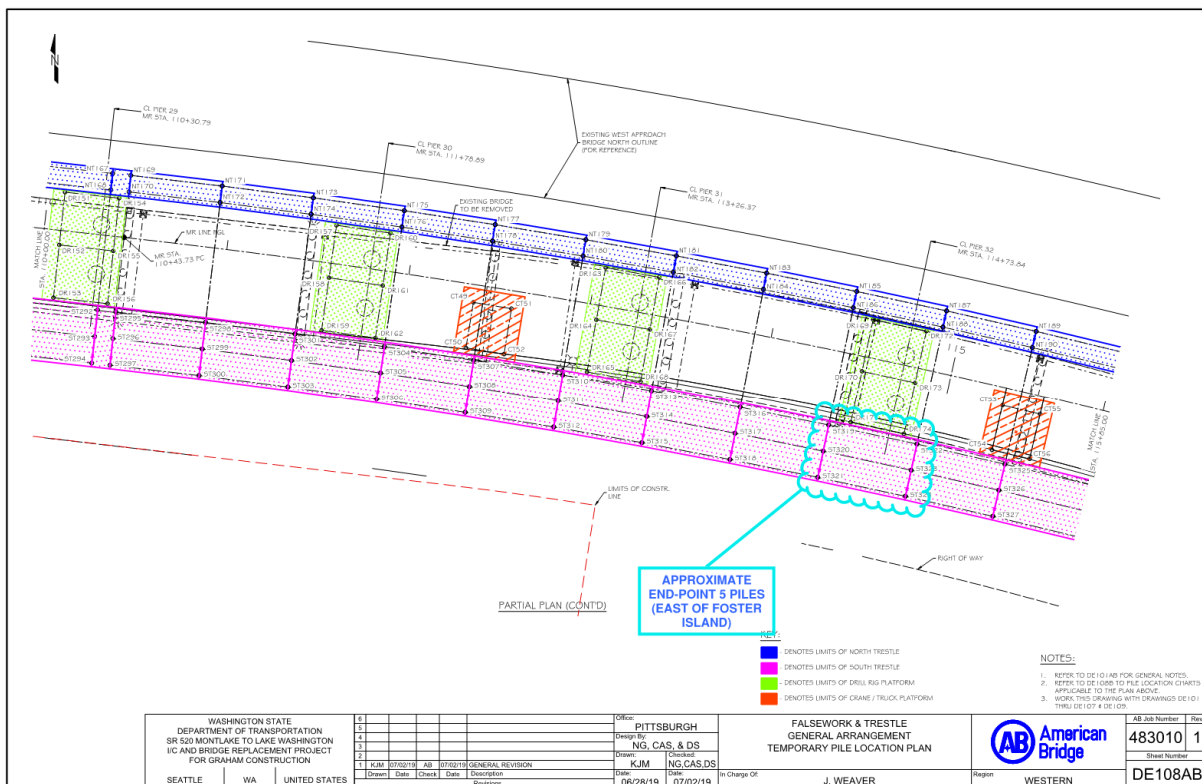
Detail of 5 Endpoint Piles East of Foster Island
